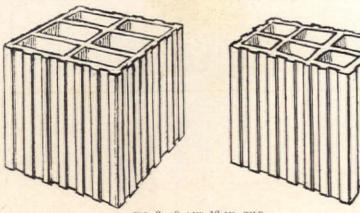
BREAKING JOINTS IN 12-IN. WALL.
